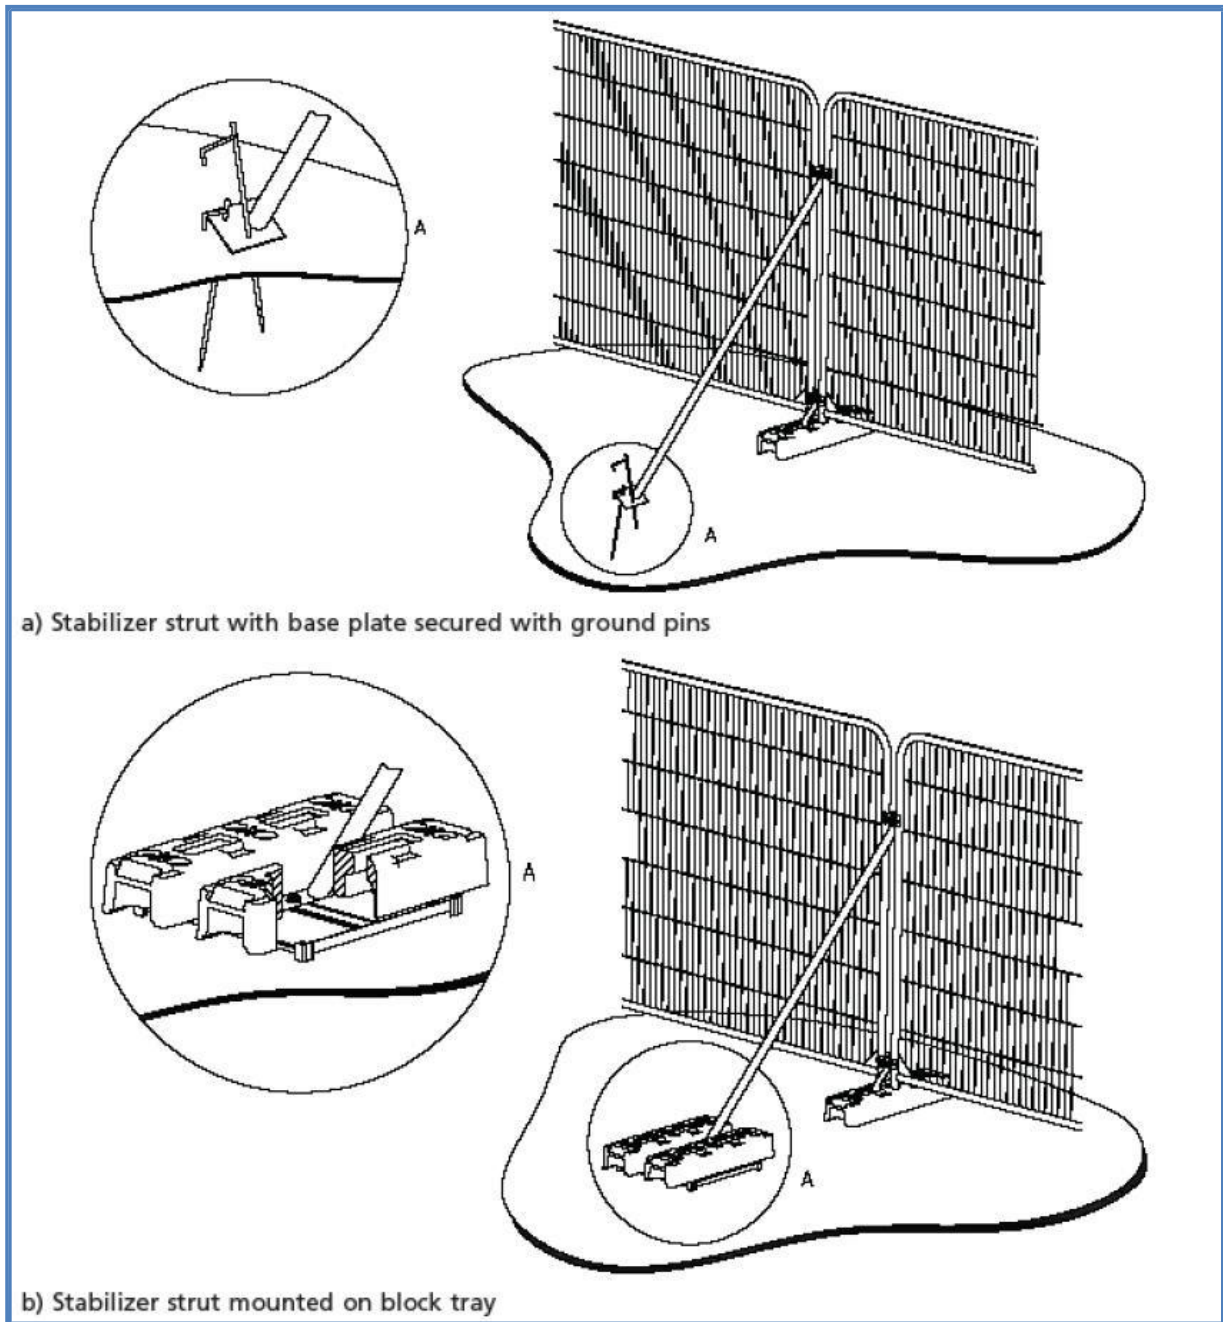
BS 5837:2012 - Figure 3 – Examples of Above Ground Stabilisation Systems
